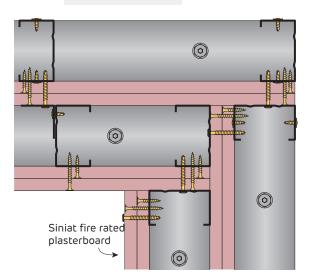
Wall Internal Corner Fire rated from both directions Built from one side only - Plan
